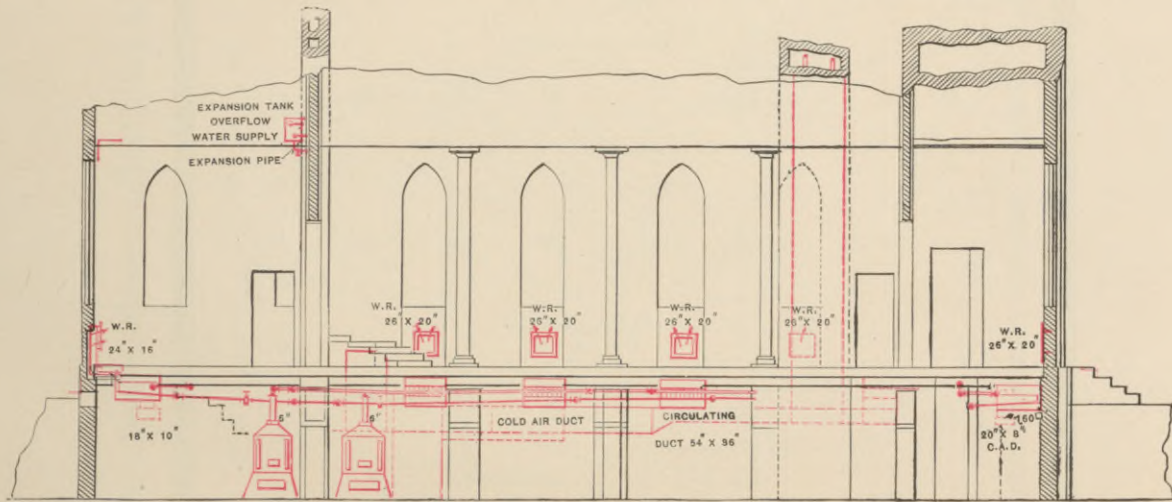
Sectional Longitudinal Elevation. Scale  $\frac{1}{8}$  inch to the foot.
